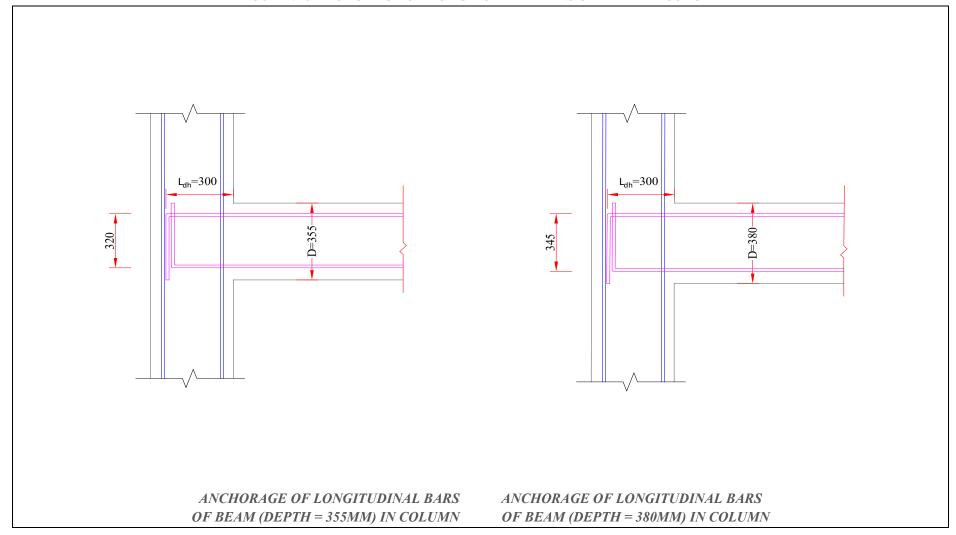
ANCHORAGE OF LONGITUDINAL BARS OF BEAM IN COLUMN
